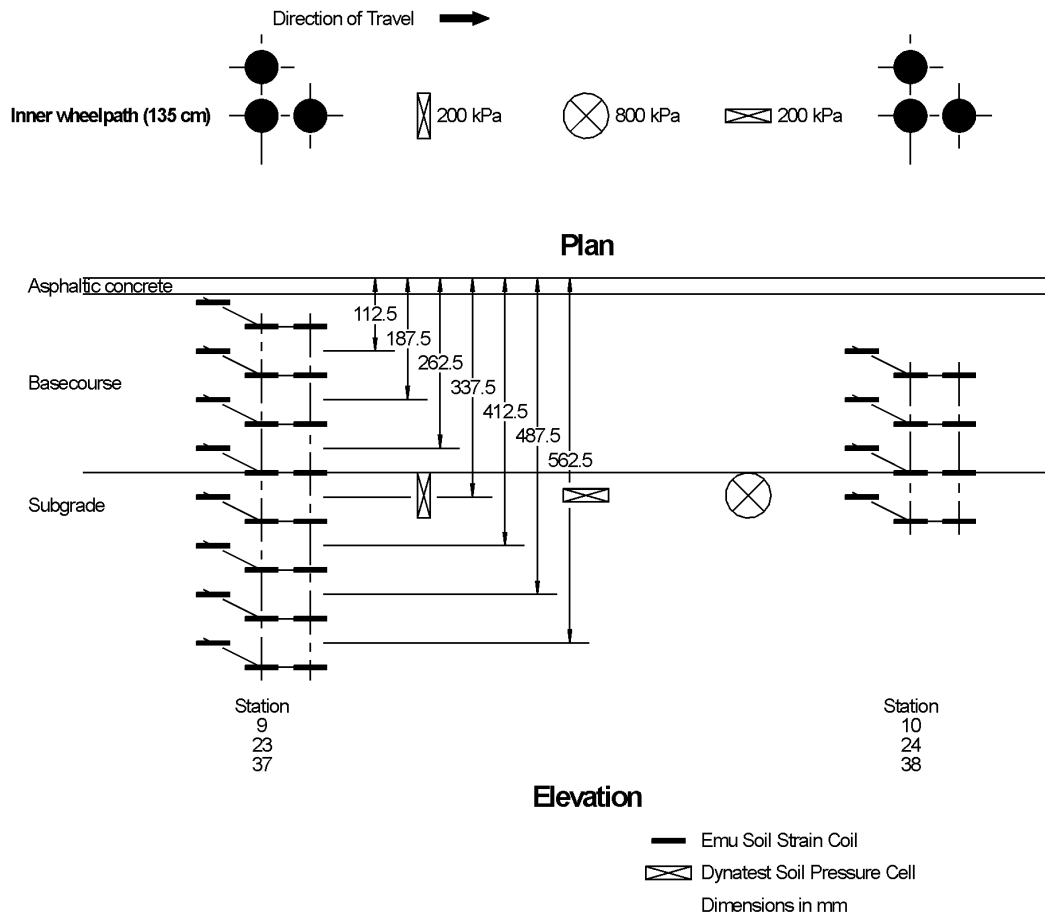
Instrument layout for the PR3-0610 pavement.
